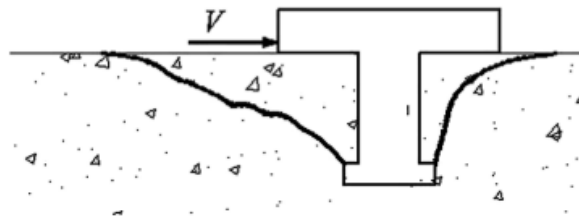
Concrete pryout failure (Jebara et al. 2015)
